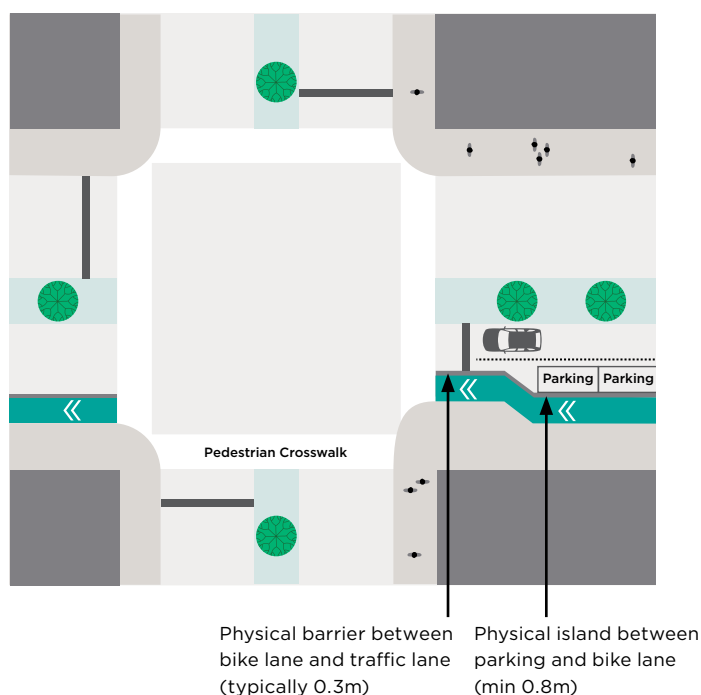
Indicative Conceptual Layout - Deviation for Footpath Widening at Intersection
